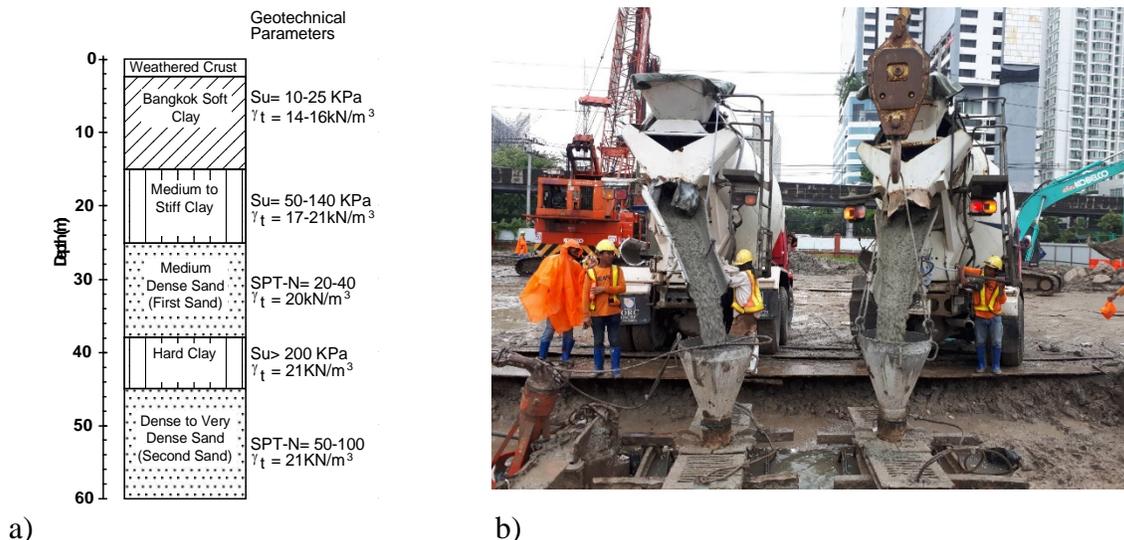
a) Typical soil profile of Bangkok and b) Concrete casting through tremie pipes.
